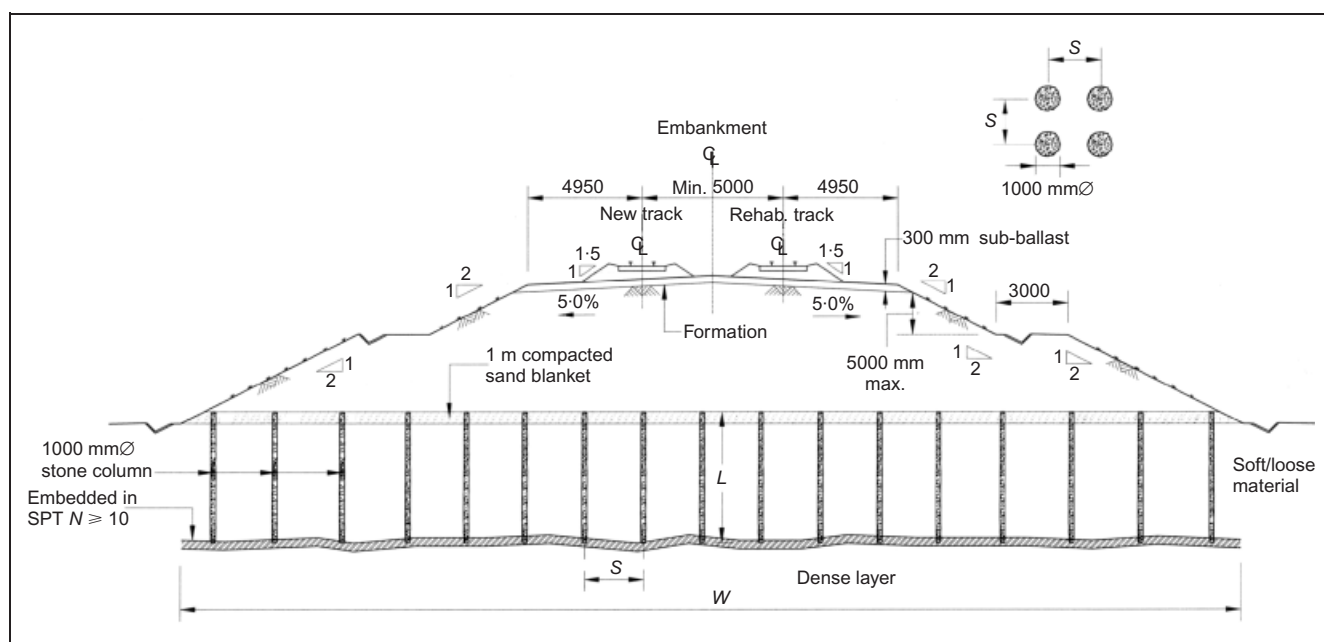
Schematic of stone column treatment scheme for new alignment comprising two new tracks (dimensions in mm)
